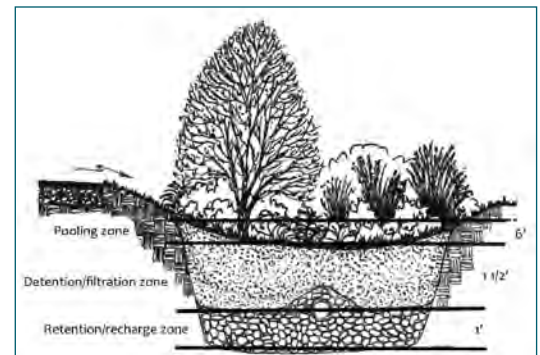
Typical cross section of a rain garden. (Source: George's County, Maryland)
